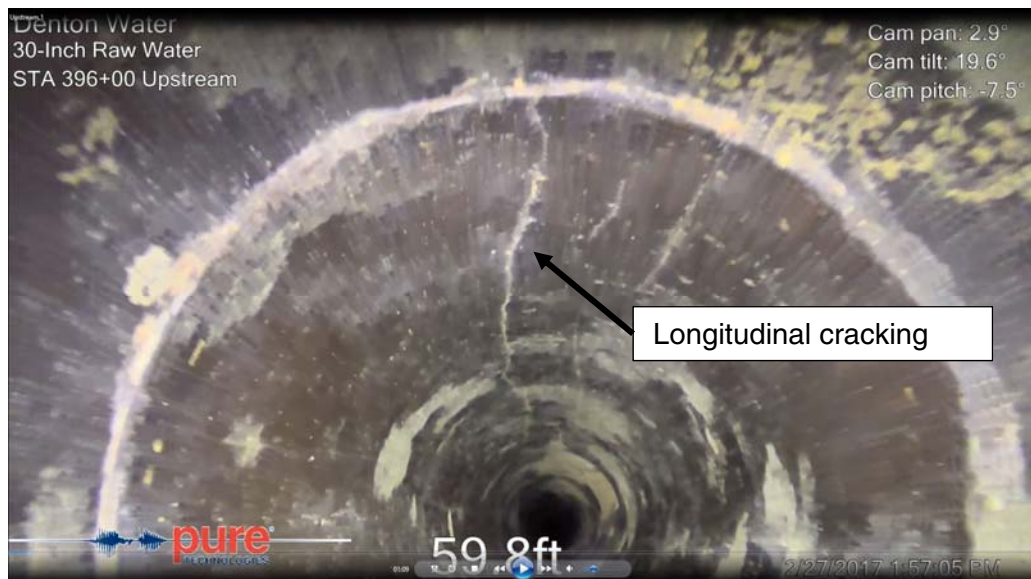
Pipe Number 3116, Longitudinal cracking along crown full length of pipe
